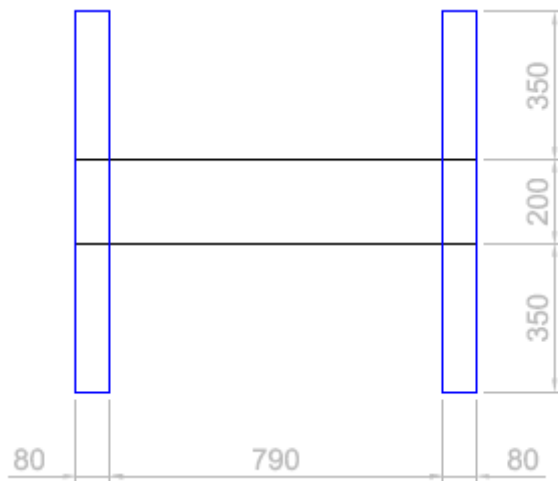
Plan view of the main beam and the two spreader beams placed symmetrically.
